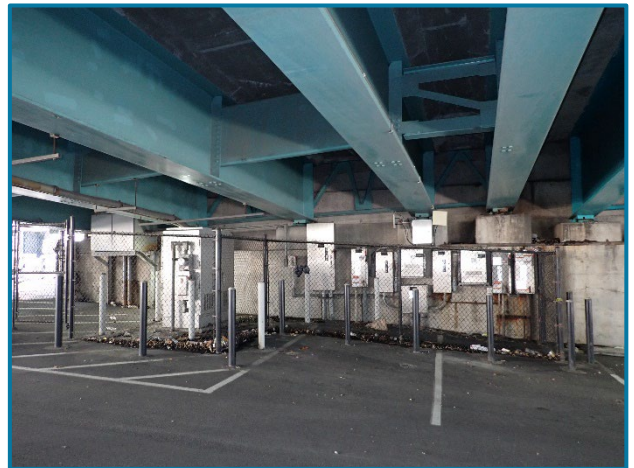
Utilities fenced in at the Wall Pier (looking north).
